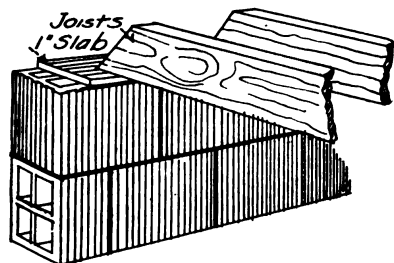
In Preparing a Hollow Tile Wall for Floor Joists, Bed Plates or 1-in. Slabs Are Laid Along the Top of the Wall to Form a Bearing Surface. These Tiles Are Also Used to Build Wall Up to the Proper Floor Heights
